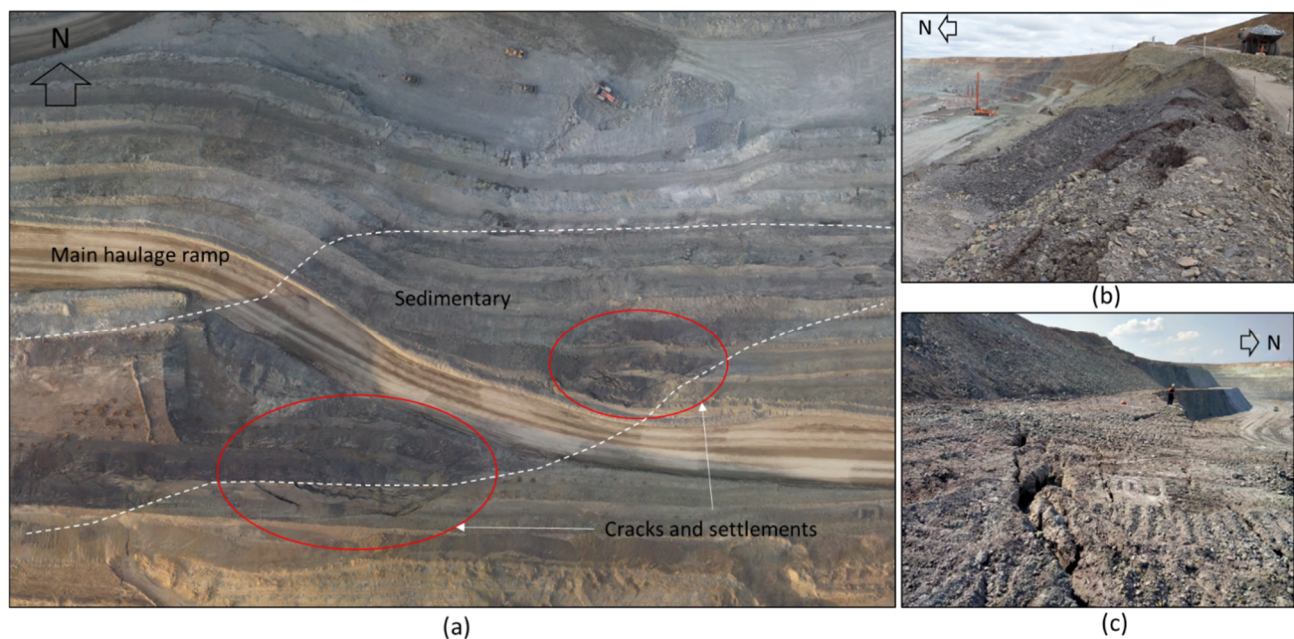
(a) Area of concern at the south wall on the plan view; (b) Lower part looking east; (c) Upper part looking west
